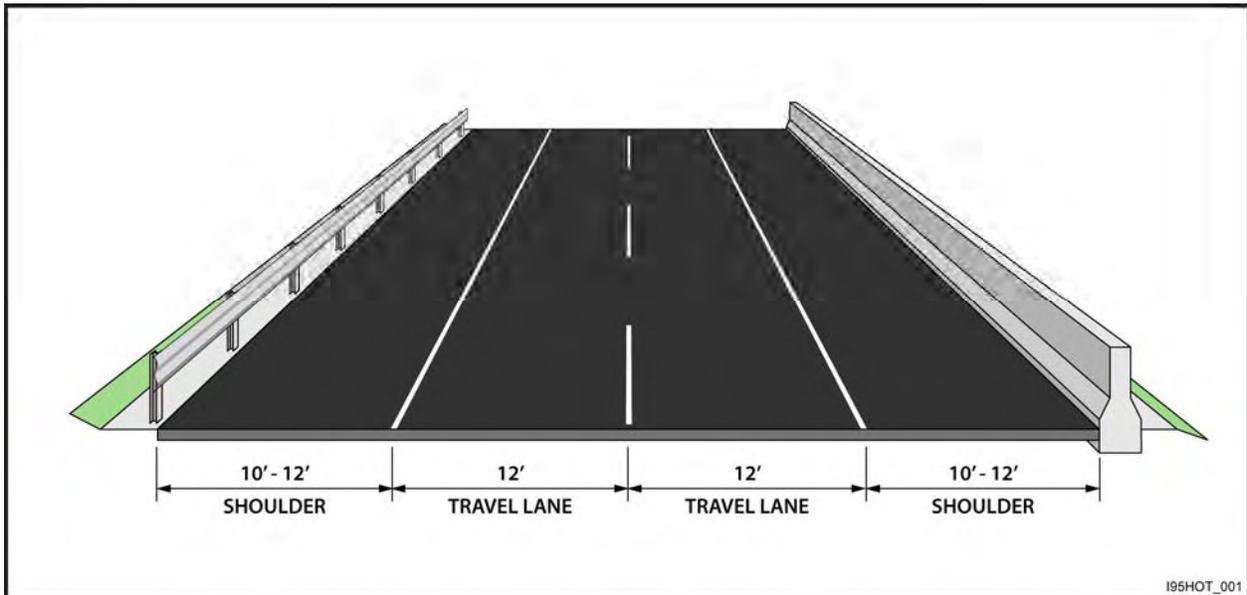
A. Typical Two-Lane Cross-Section – New Pavement
